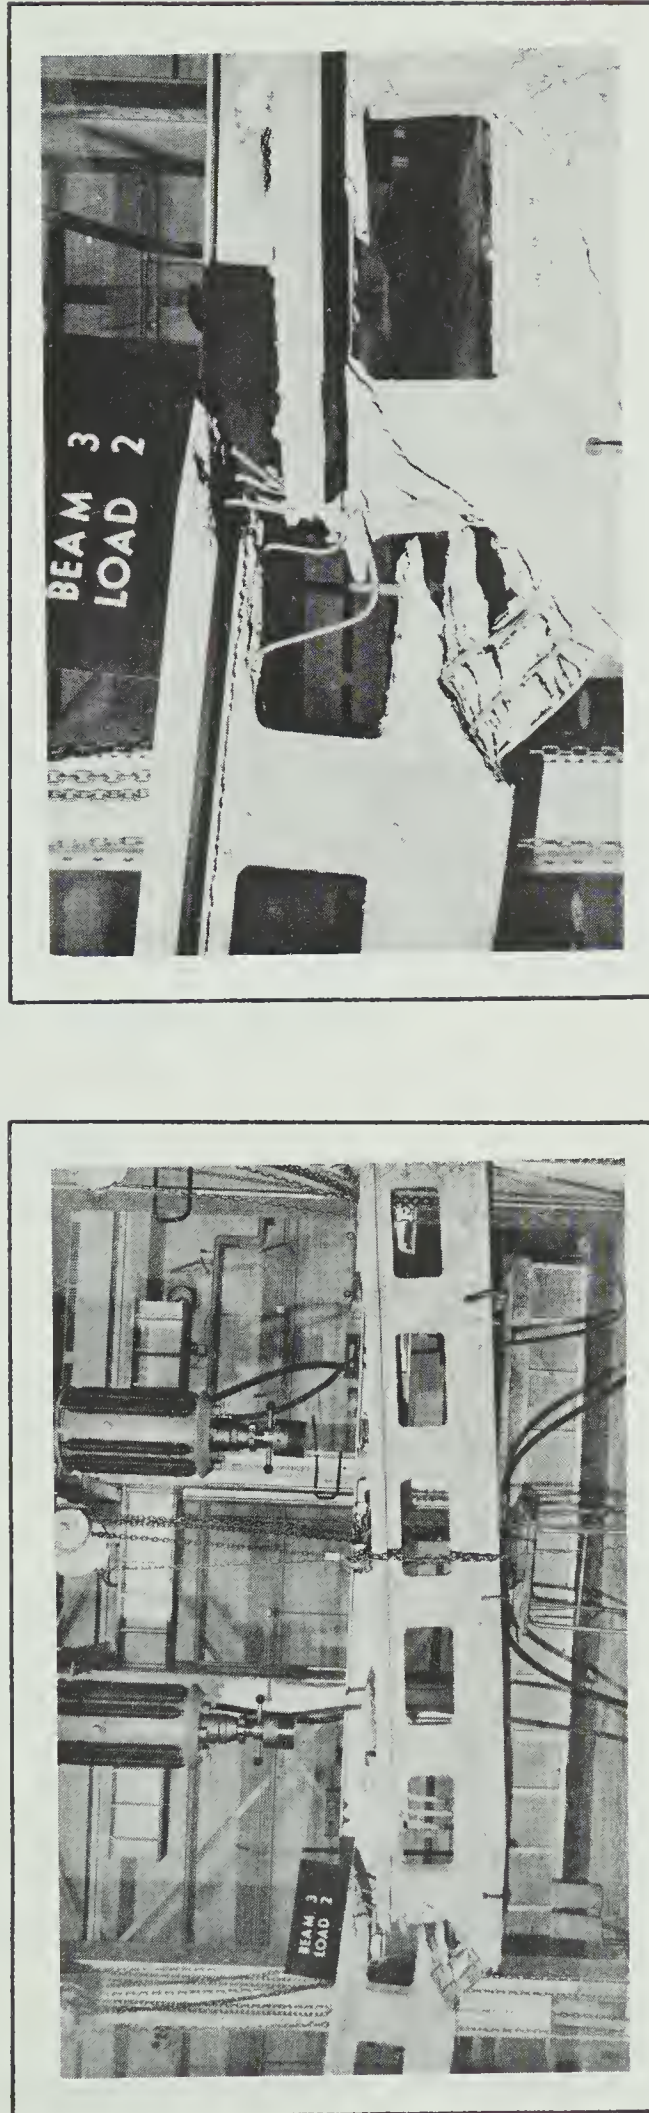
BEAM #3 CRACKING AND FAILURE PATTERNS
